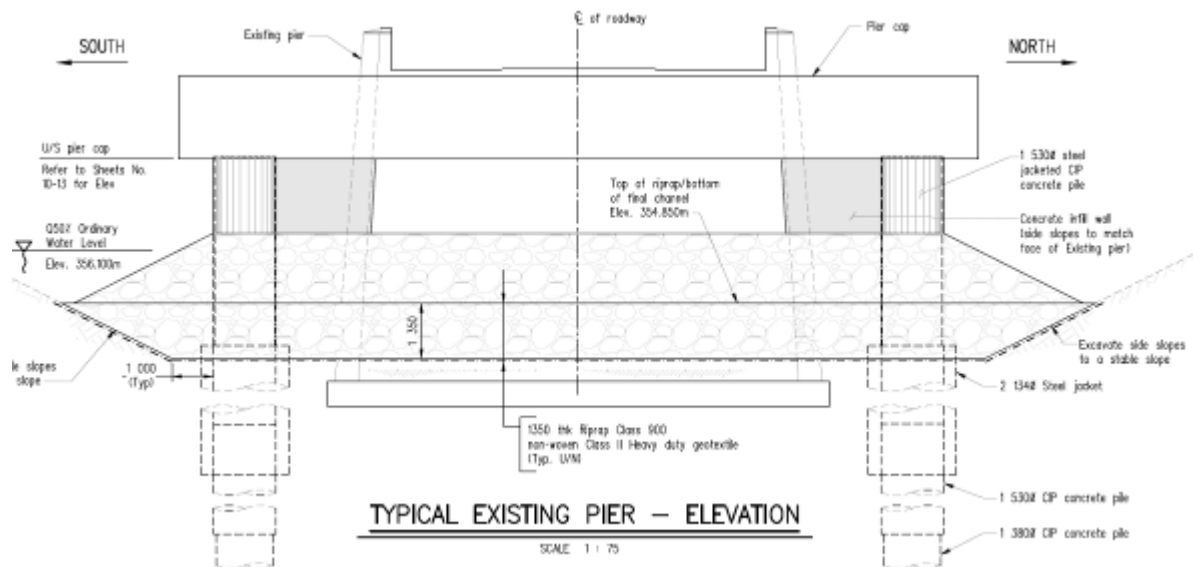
Section of Pier, Showing Drilled Shaft Foundation, Concrete Pier Cap, and Concrete Infill Walls
